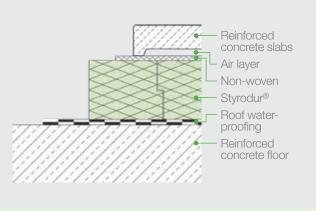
Parking roof with large-size reinforced concrete slabs on pavement slab supports.
